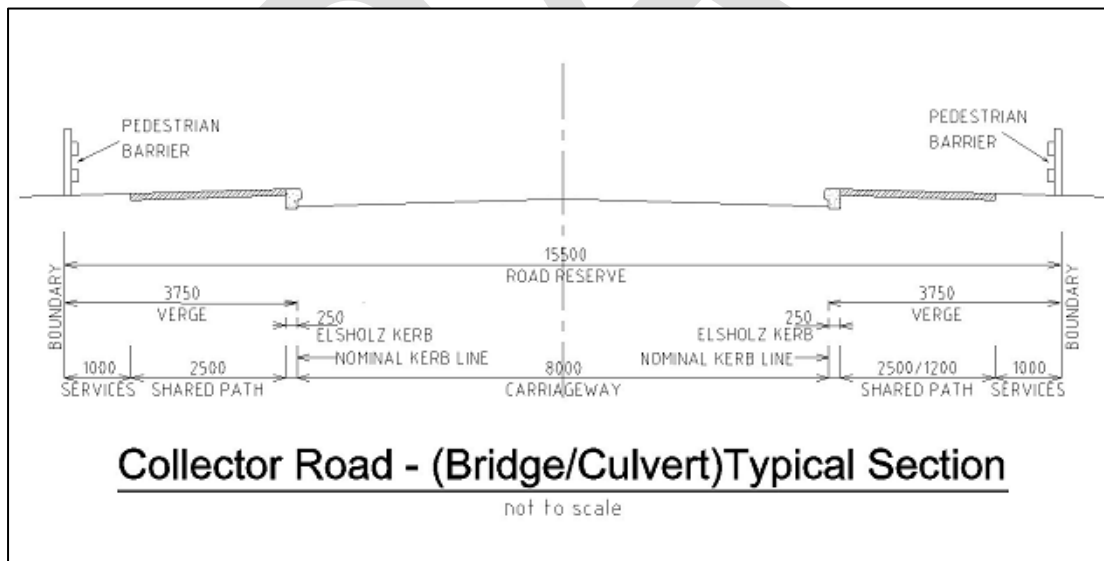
Manooka Valley Collector Road (Bridge/Culvert) Typical Section
